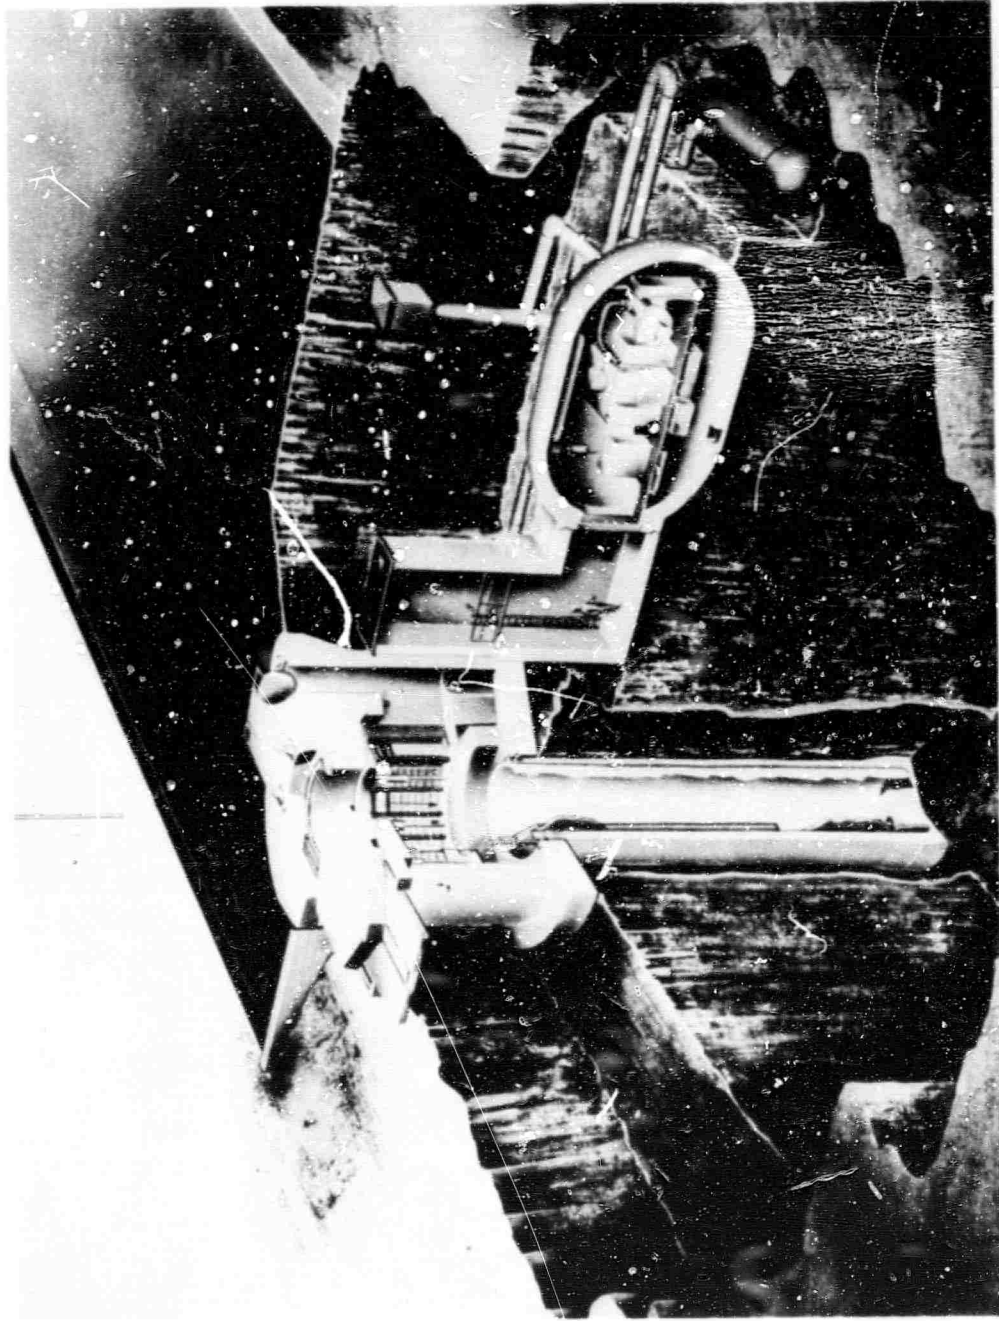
Minuteman launch facility; relation of launch equipment room, access shaft, and launch equipment building.
